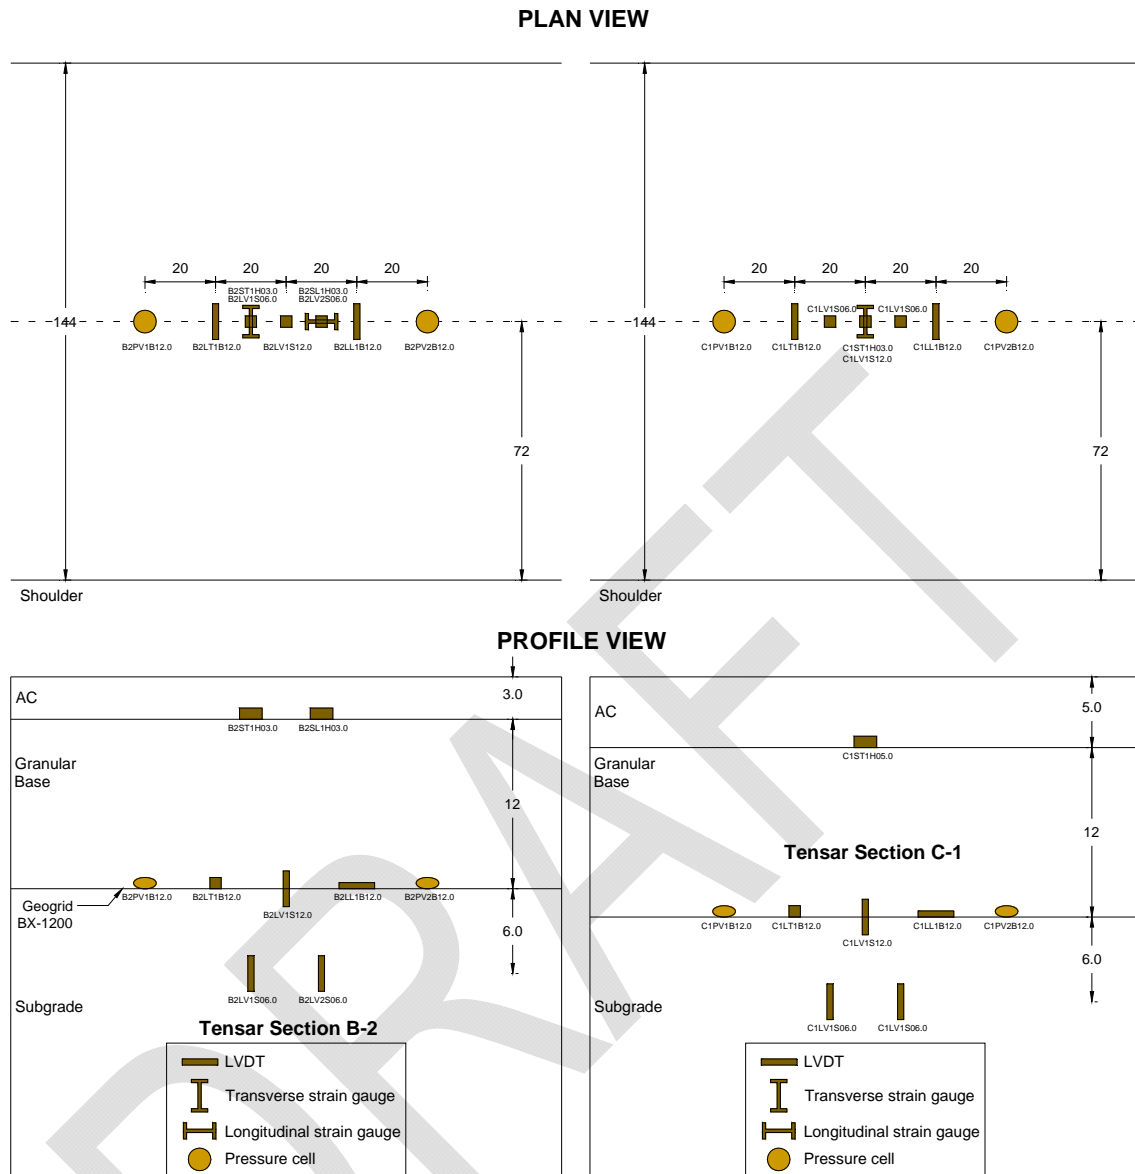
Plan and profile view of pavement structure and instrumentation of thin Section B-2 and C-1 at ATREL-UIUC
